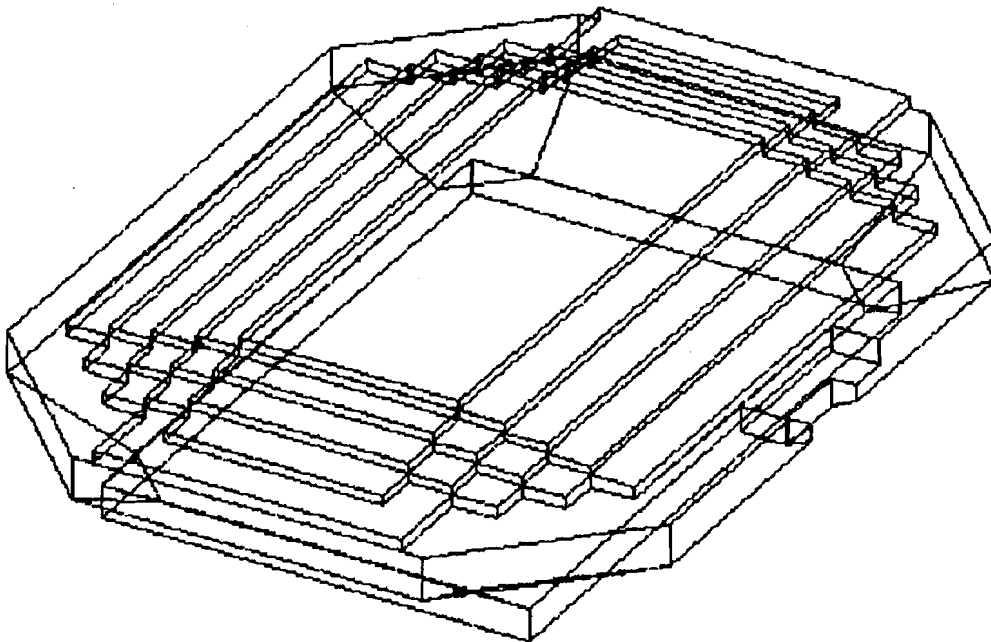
The geometrical model of this gymnasium. (Floor: wood flooring, Wall: concrete, Ceiling: rock wool board.)
